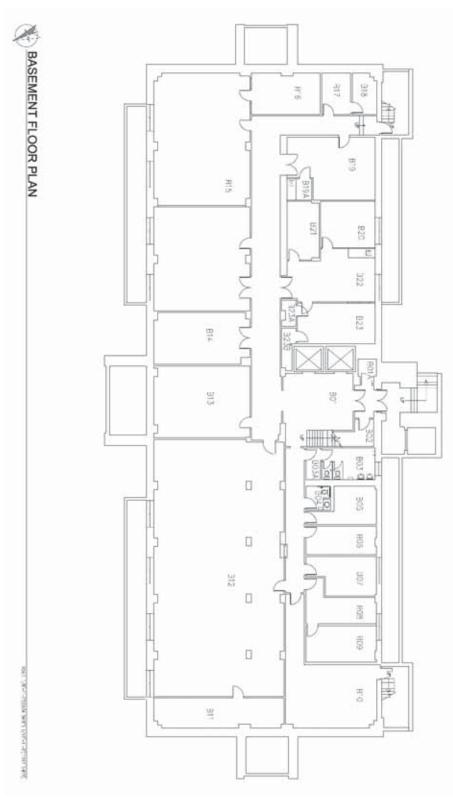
Basement Floor Plan (source: VT Buildings & General Services, N.T.S.)
